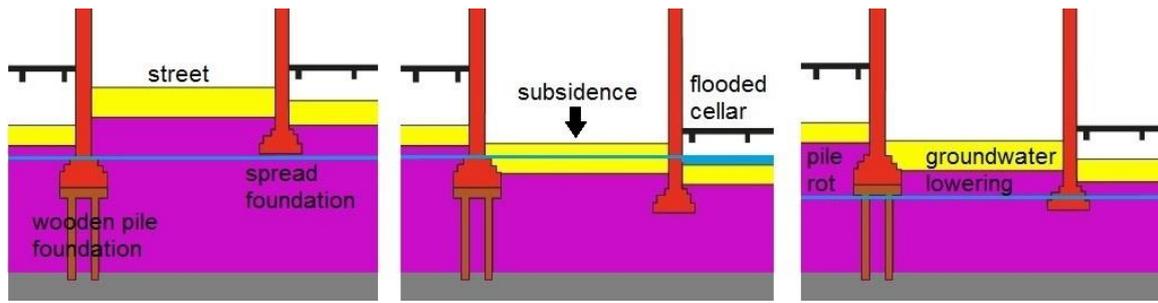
Illustration of the effects of subsidence on buildings founded on wooden piles and spread footing foundations (indicated in left figure). Red indicates the walls and top of the foundation, black = floor level, brown = wooden piles, yellow = anthropogenic deposits, violet = peat, grey = solid sandy deposits and the blue line indicates the groundwater level. Middle figure: through time, peat is compressed due to loading, causing the street and spread footing founded house to subside and the cellar of this house to flood. Right figure: groundwater is lowered to keep the cellar of the spread footing founded house dry, which additionally causes the wooden piles to rot.
